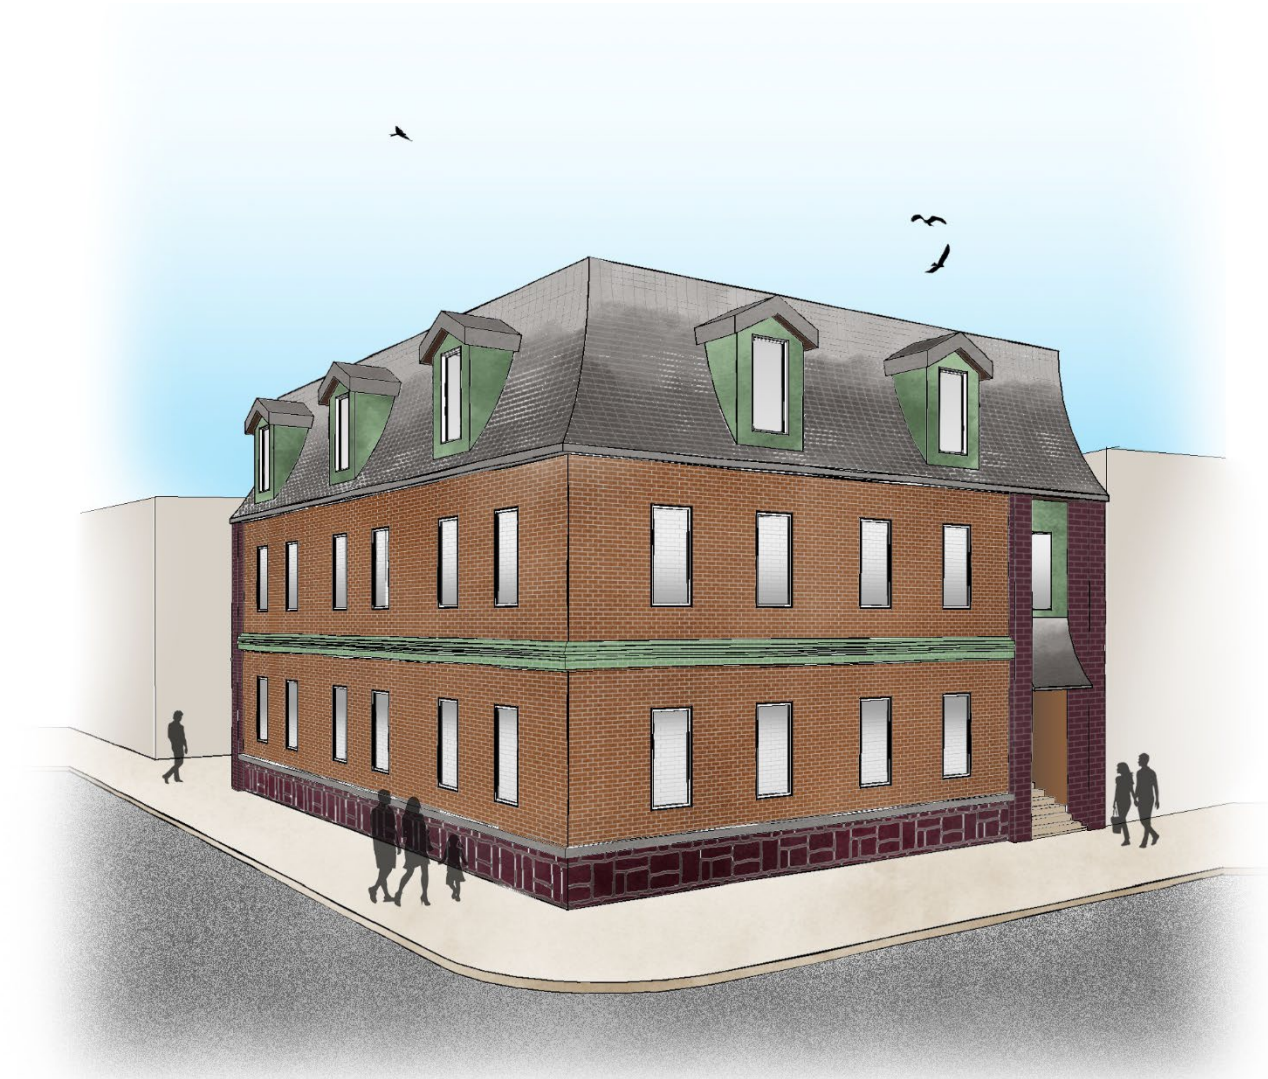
3D View of Proposed New Development Opportunity at 55 North Penn Street
